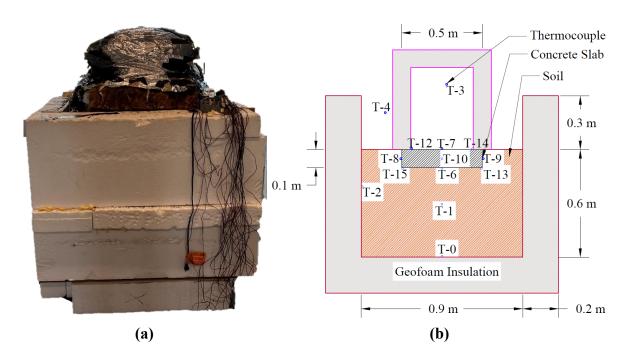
(a) Test setup and (b) instrumentation plan for Control test on bare slab
